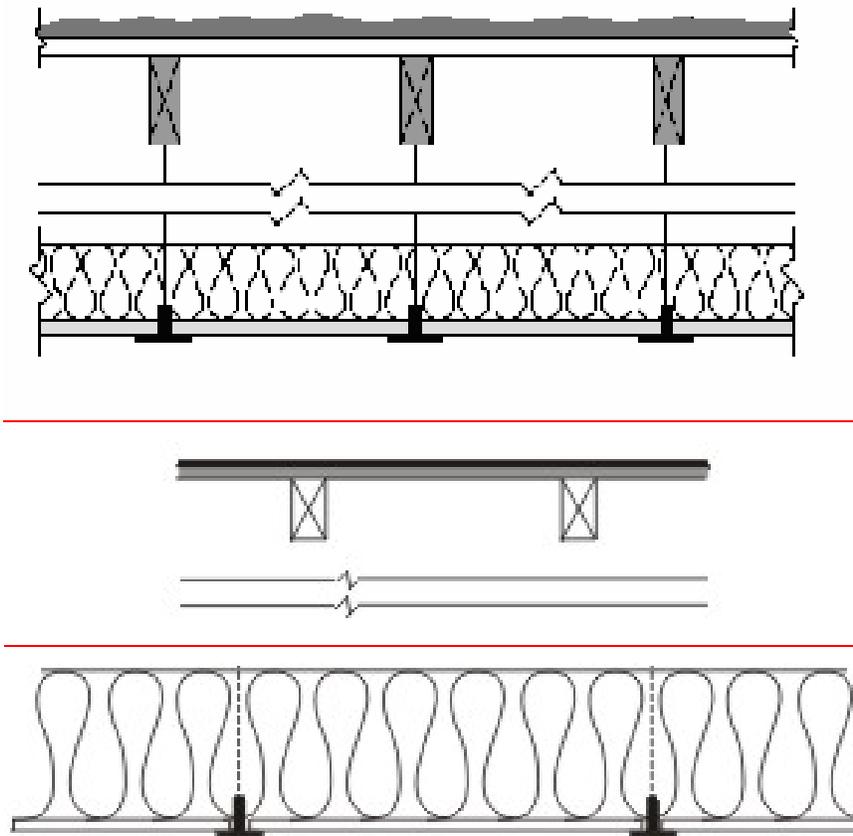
Insulated Ceiling with Removable Panels
